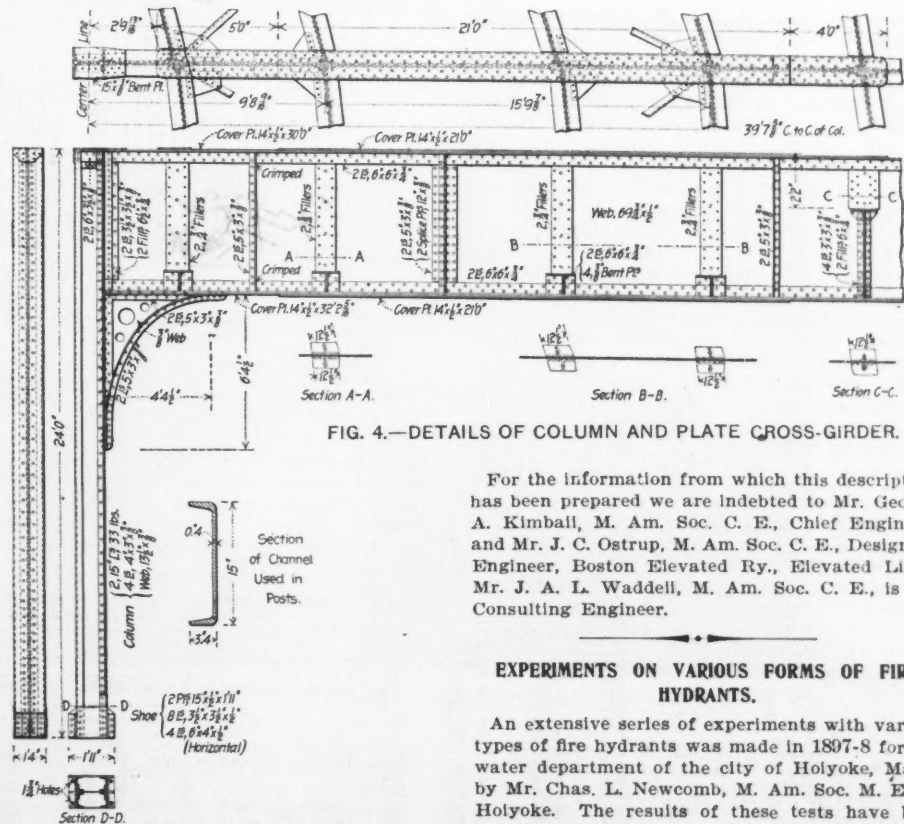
DETAILS OF COLUMN AND PLATE CROSS-GIRDER.
